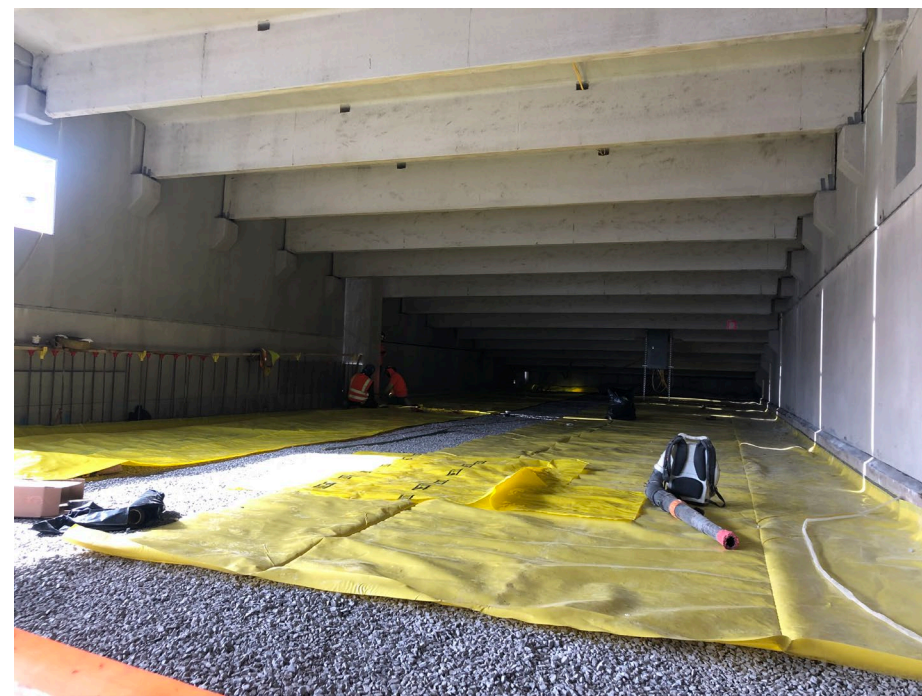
Kingdom installing vapor barrier in grid B3 and B2 under the ramp.
